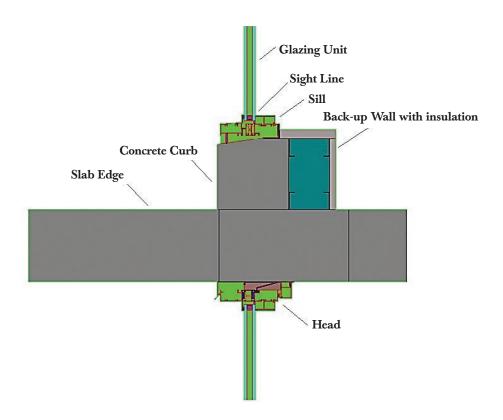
THERM MODELS ON BYPASS DETAIL AND EXTENDED SLAB EDGE DETAIL
